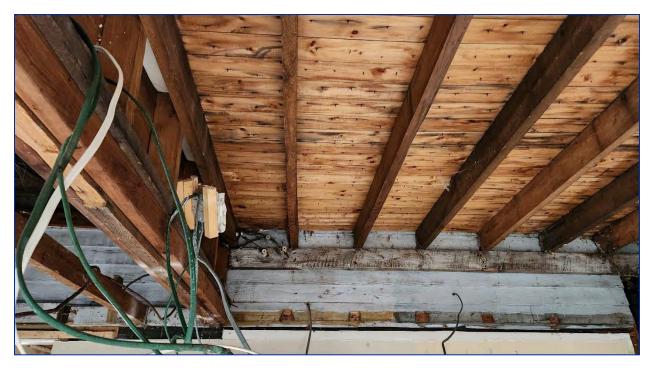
View of the basement showing wooden beams and joists supporting floorboards.
